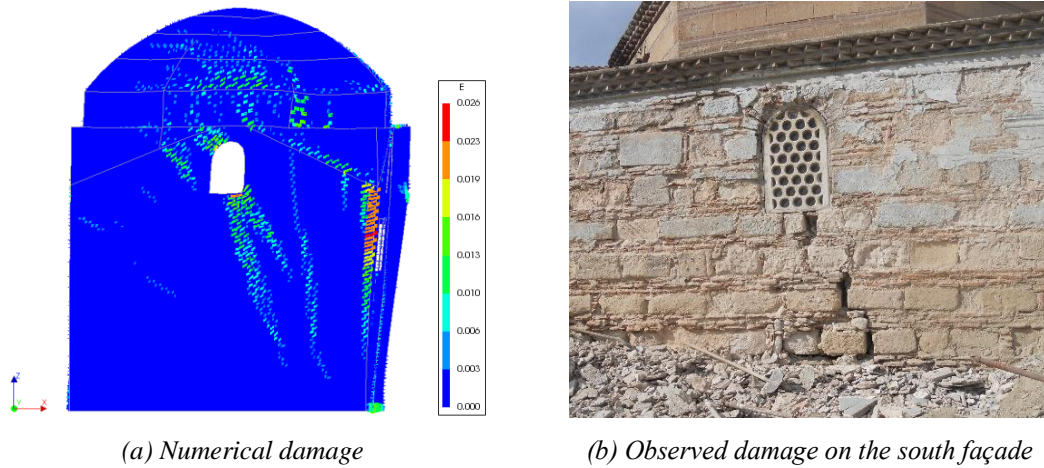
The non-retrofitted numerical and real damage on the south wall, maximum principal strain distribution at load factor 0.27g in +X direction
